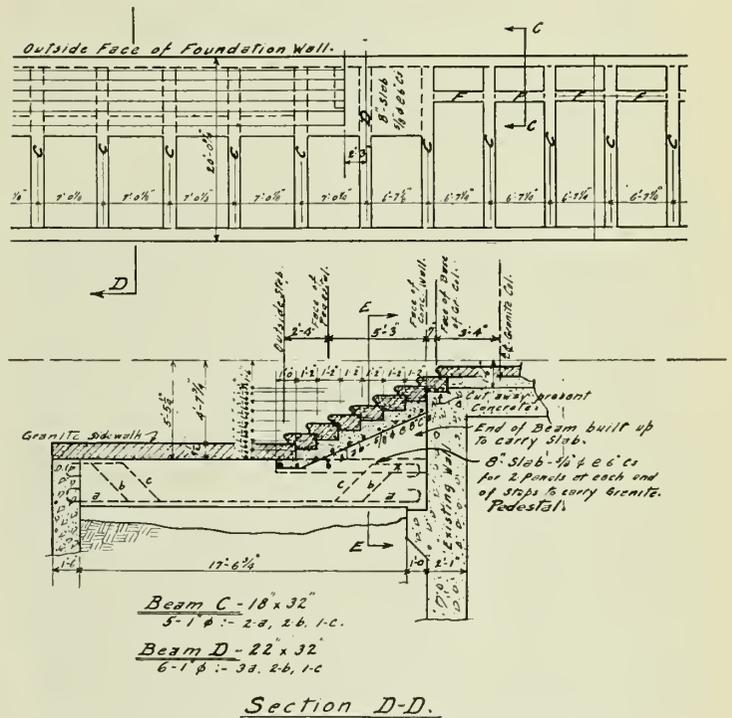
Plan and Section of Sidewalk and Steps, Metcalfe street.
